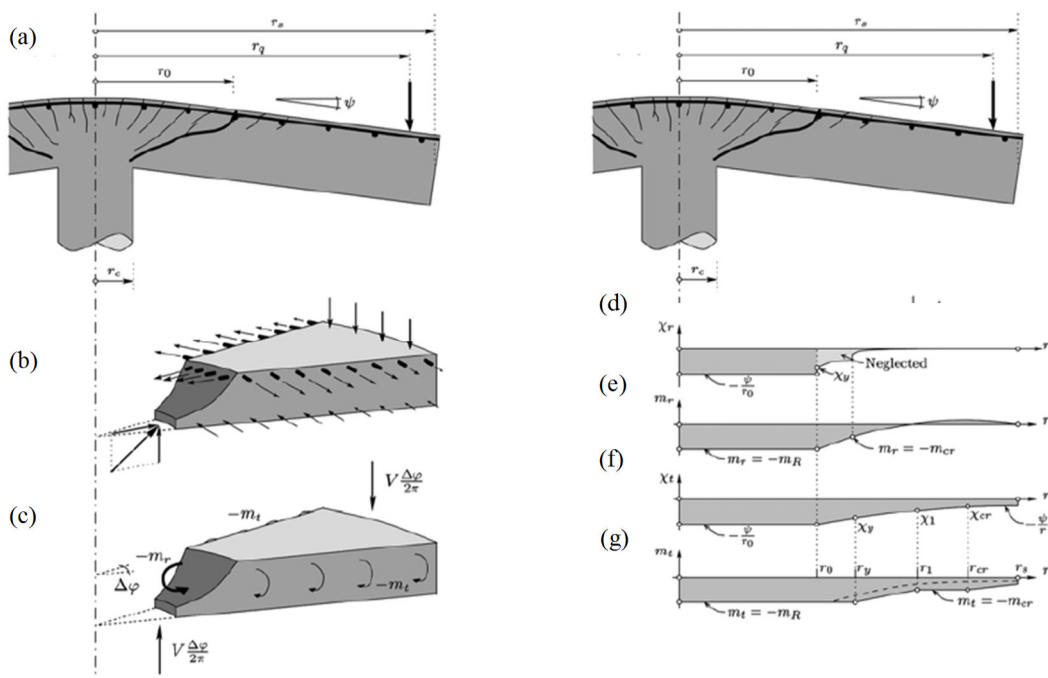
Assumed behavior for axisymmetric slab: (a) geometrical parameters and rotation of slab; (b) forces in concrete and in reinforcement acting on slab sector; (c) internal forces acting on slab sector; (d) distribution of radial curvature; (e) distribution of radial moment; (f) distribution of tangential curvature; and (g) distribution of tangential moments for quadrilinear moment-curvature relationship (shaded area) and for bilinear moment-curvature relationship (dashed line) [Muttoni, 2008].
